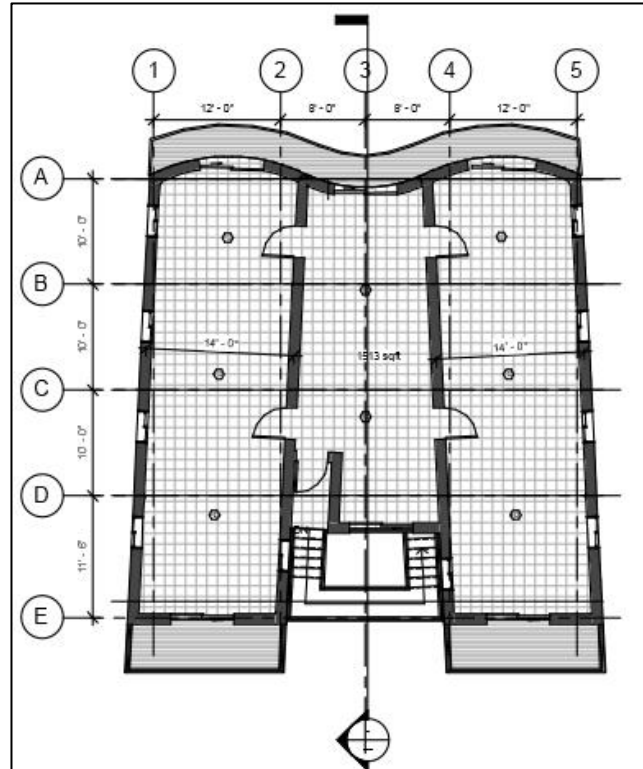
(b) Floor Plan of Proposed Design with drainage plan
